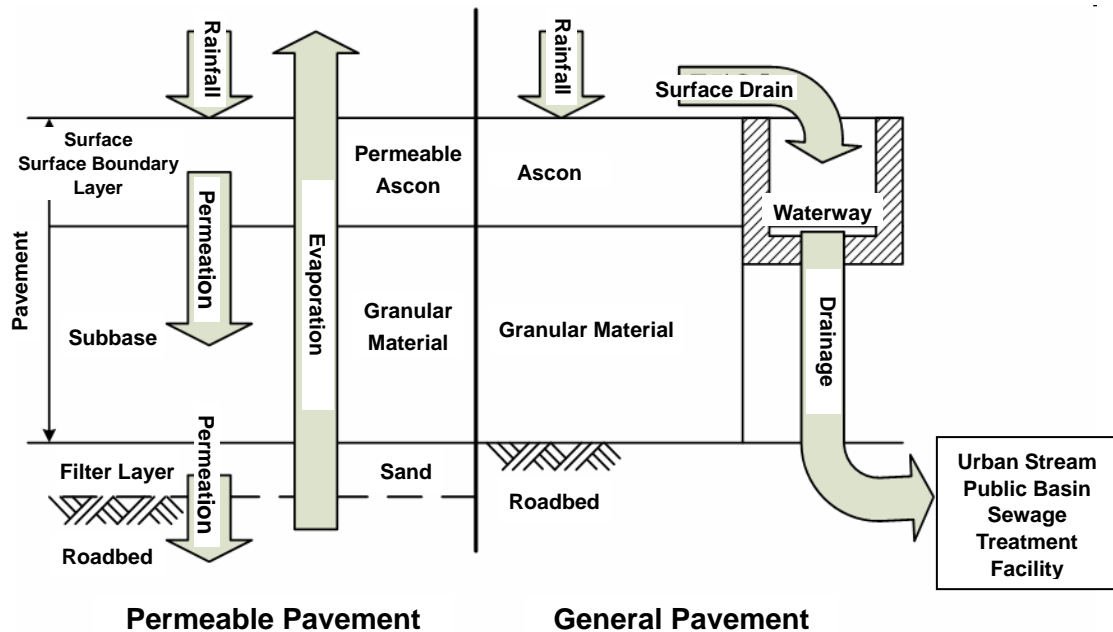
Comparison of Structure between General Pavement and Permeable Pavement
